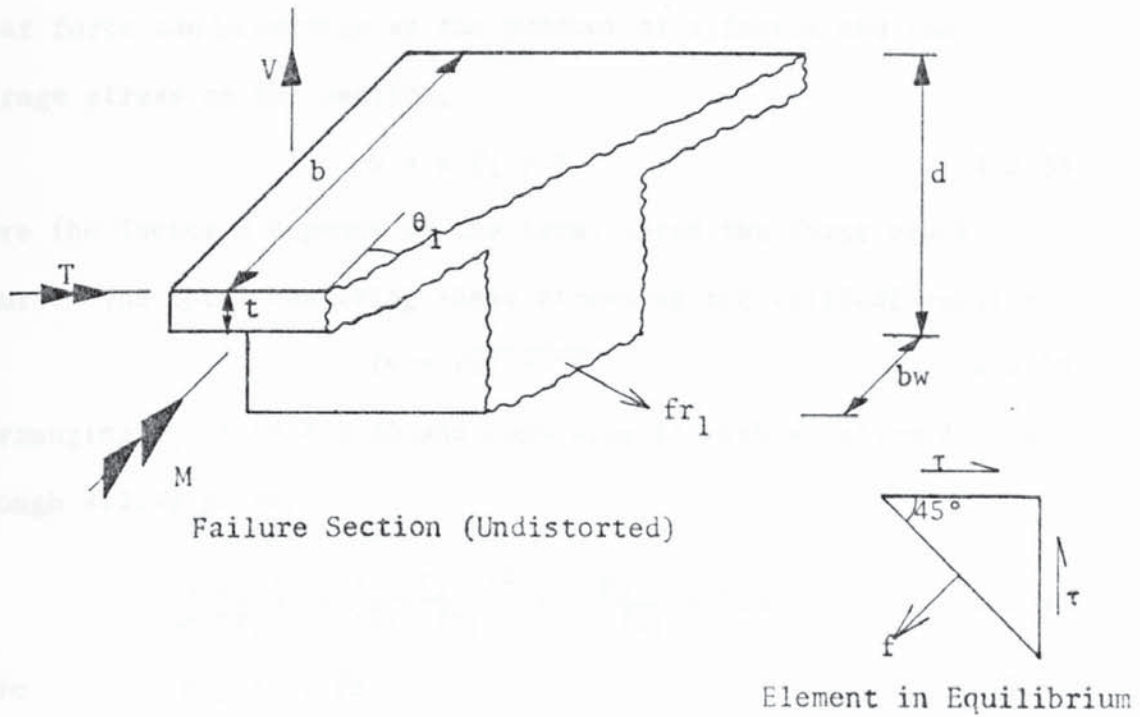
MODE ONE FAILURE IN PLAIN CONCRETE T-MEMBERS UNDER COMBINED LOADING
